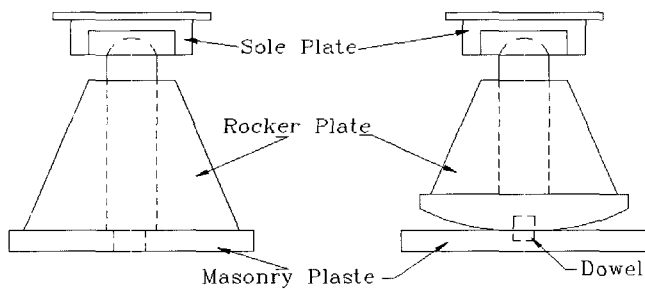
General shape of steel rocker bearings (fixed and expansion type)
